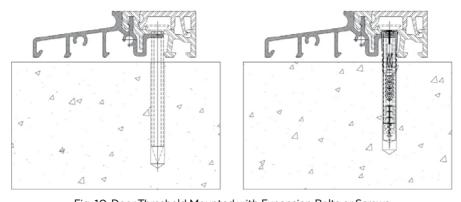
Door Threshold Mounted with Expansion Bolts or Screws
